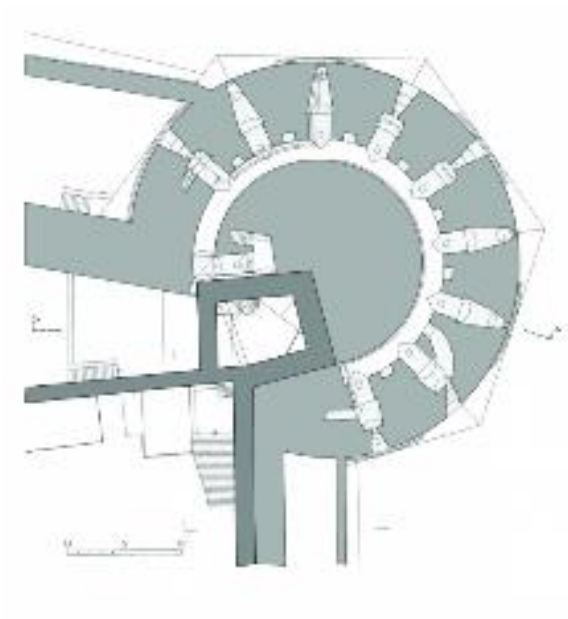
The Tower of Minčeta in Dubrovnik. Ground plan of the second floor. From Deanović, Ana and Ivo Tenšek. “Predziđe dubrovačke Minčete”, pp. 307.
